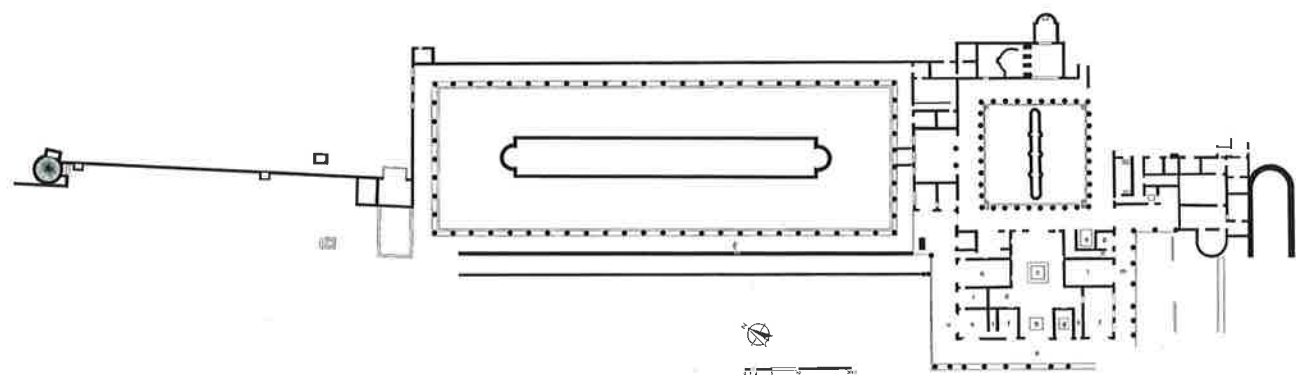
Villa of the Papyri, plan. Drawing: Lorene Sterner and Timothy J. Liddell.
